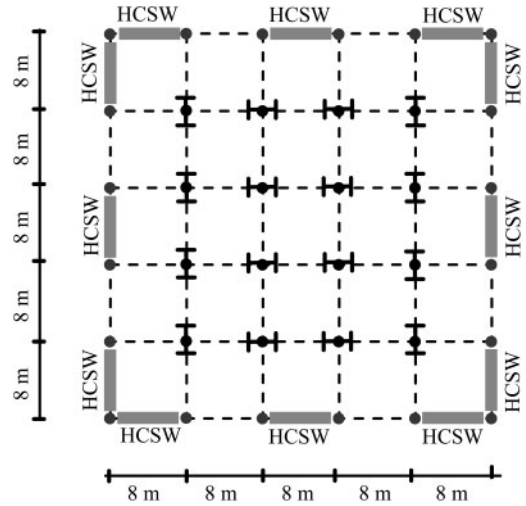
Floor geometry of the benchmark structures with positions of the HCSWs.
